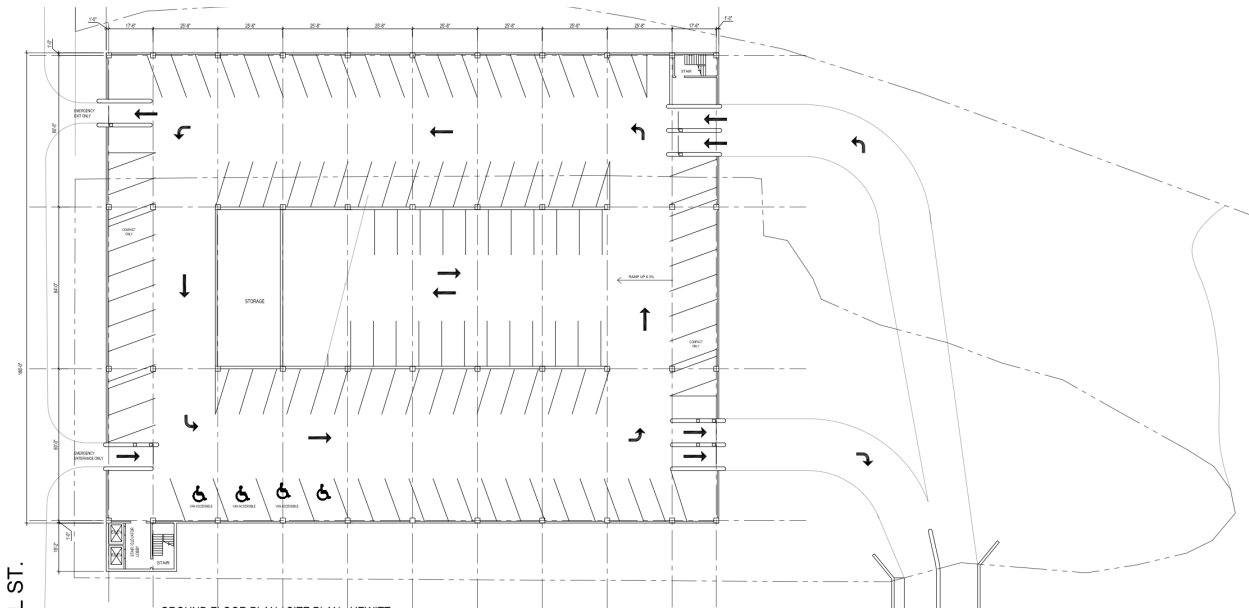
630-Space Hewitt Parking Structure Two Access Design Alternative
